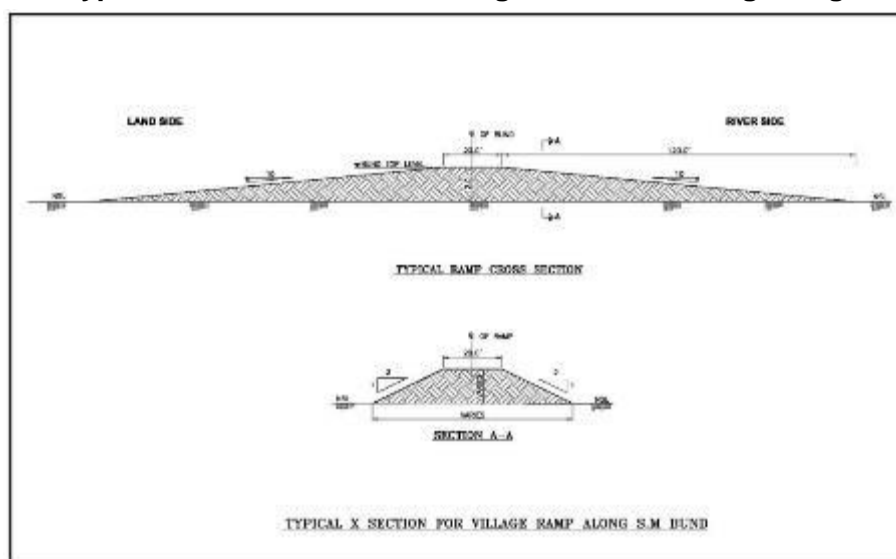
Typical Cross Section of Village Ramp along SM Bund and proposed repair works
